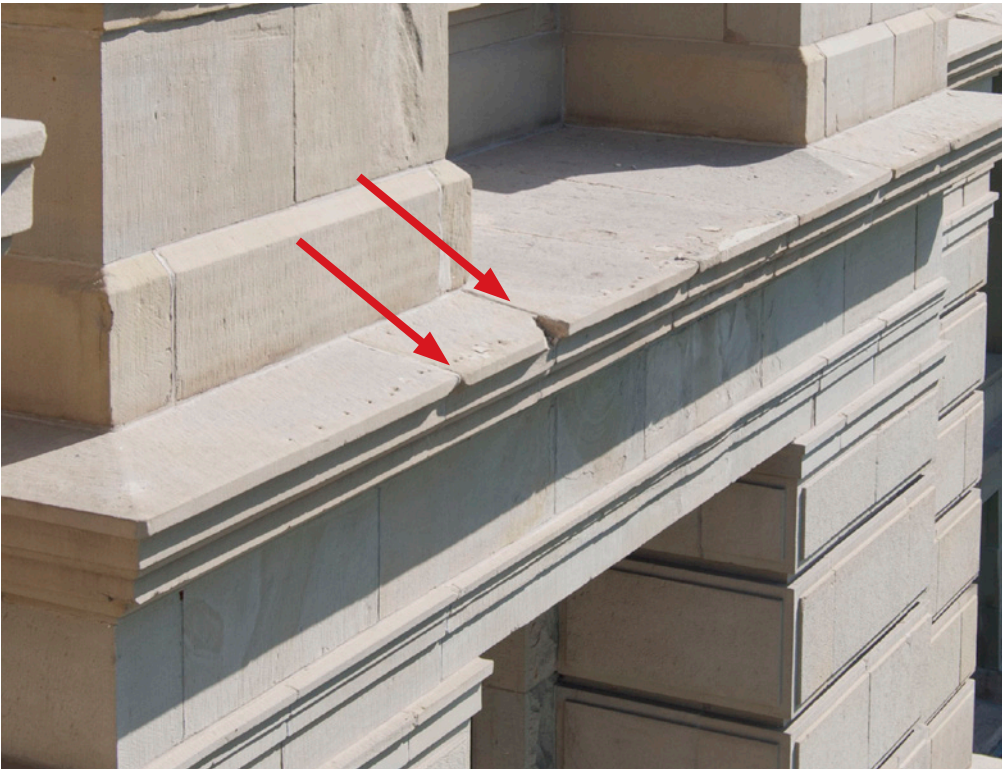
Spalls Adjacent to Open Joints at Cornice.
